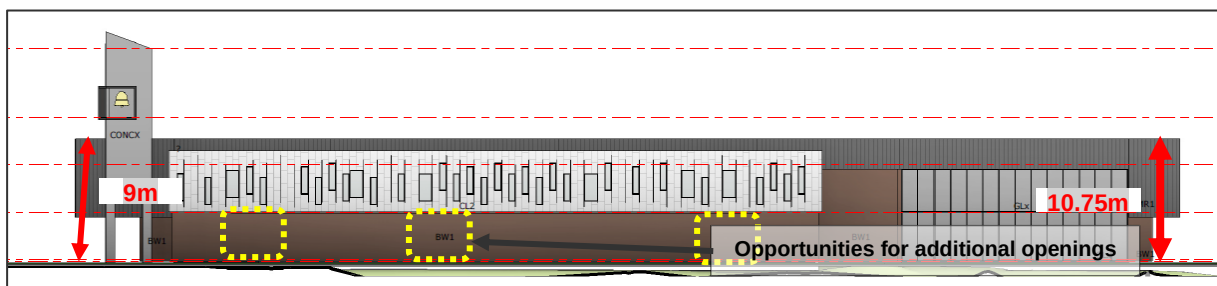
| Indoor recreation centre as viewed from Fourth Avenue (Source: Applicant's SRTS)
